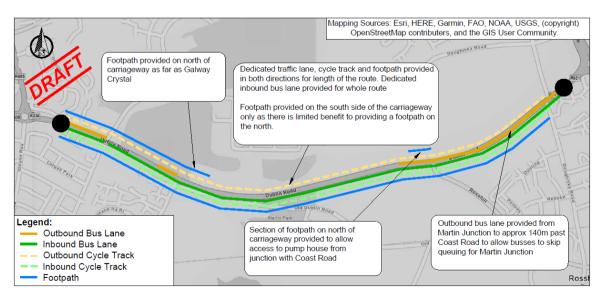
Section 2 Option 6A Indicative Scheme Design
